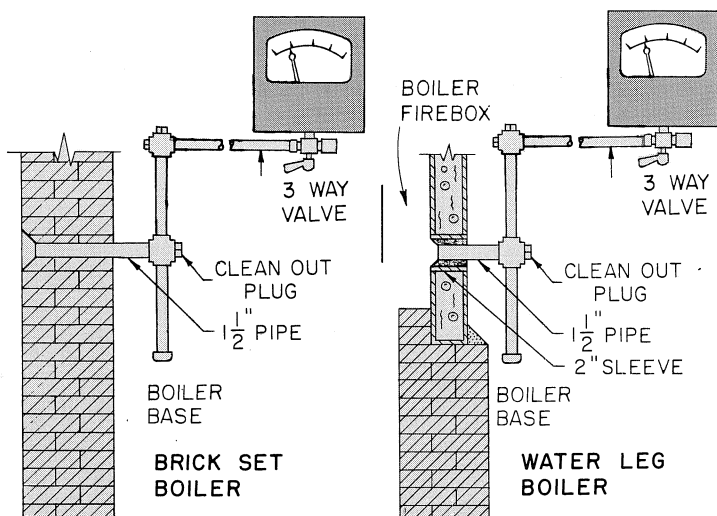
TYPICAL FURNACE DRAFT OR PRESSURE SAMPLE CONNECTIONS
